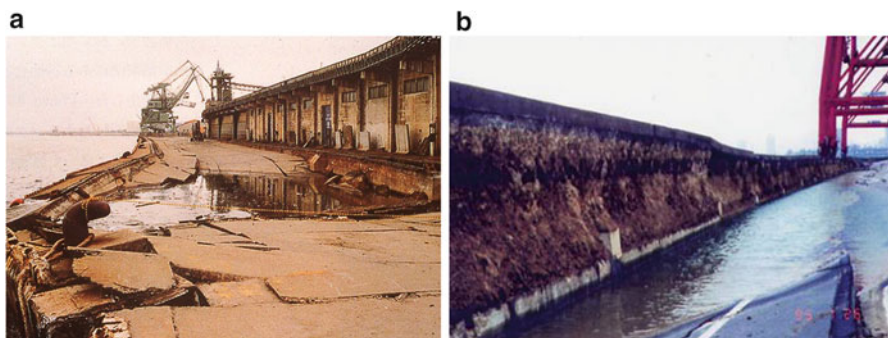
Damage to coastal revetments due to soil liquefaction. (a) Inclination and subsidence of sheet pile wall (1983 Central Japan Sea earthquake). (b) Large movement of concrete caisson quay wall and ground subsidence (1995 Kobe earthquake)
